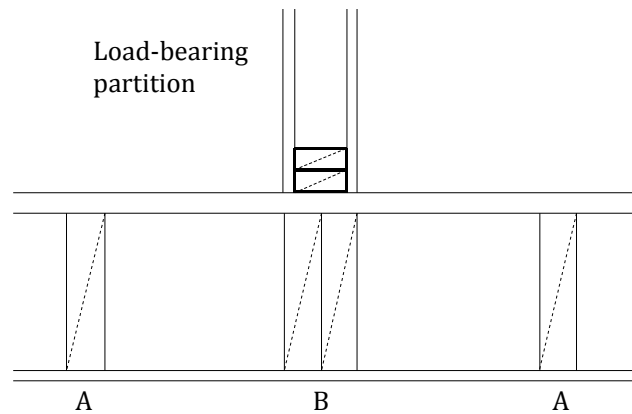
Vertical section of a load-bearing partition supported by a timber joisted floor, *ad.* (Ozelton and Baird 2006)
